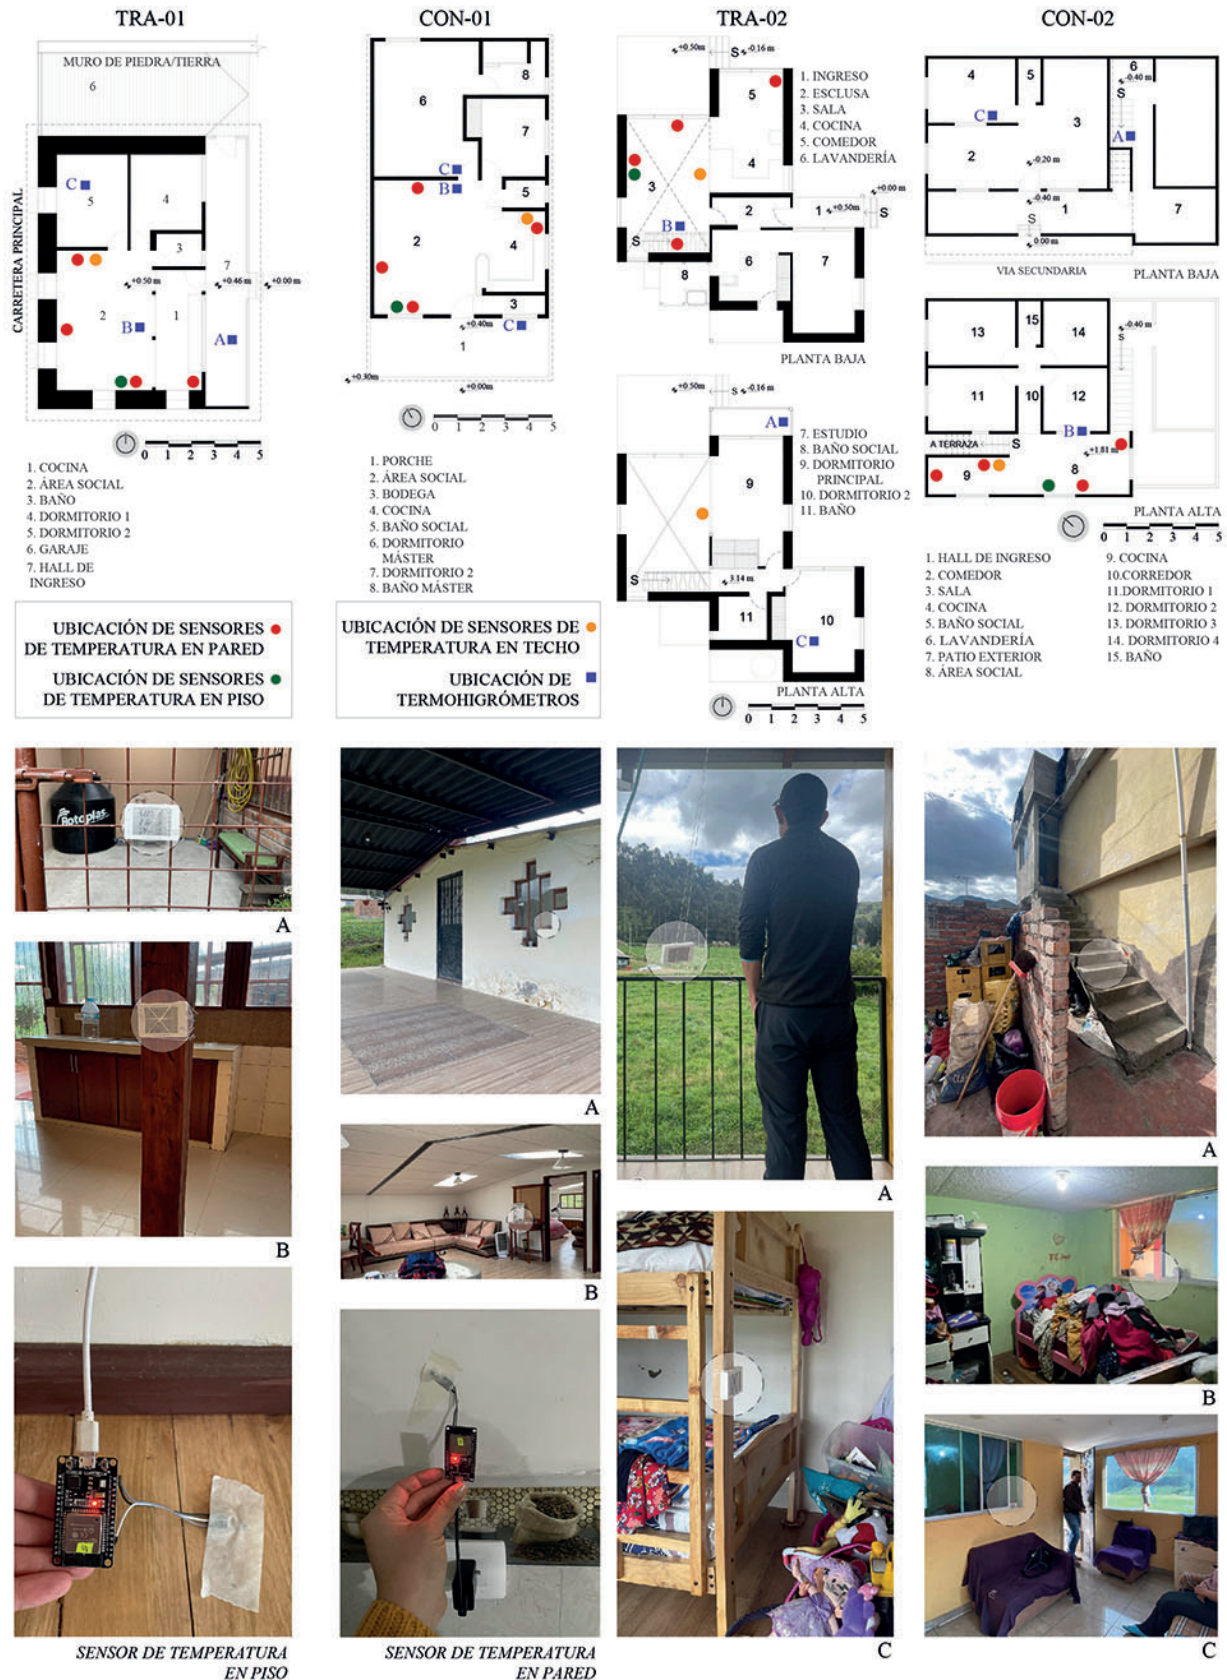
Floor plans and equipment location in case studies. Source: Preparation by the Authors.
